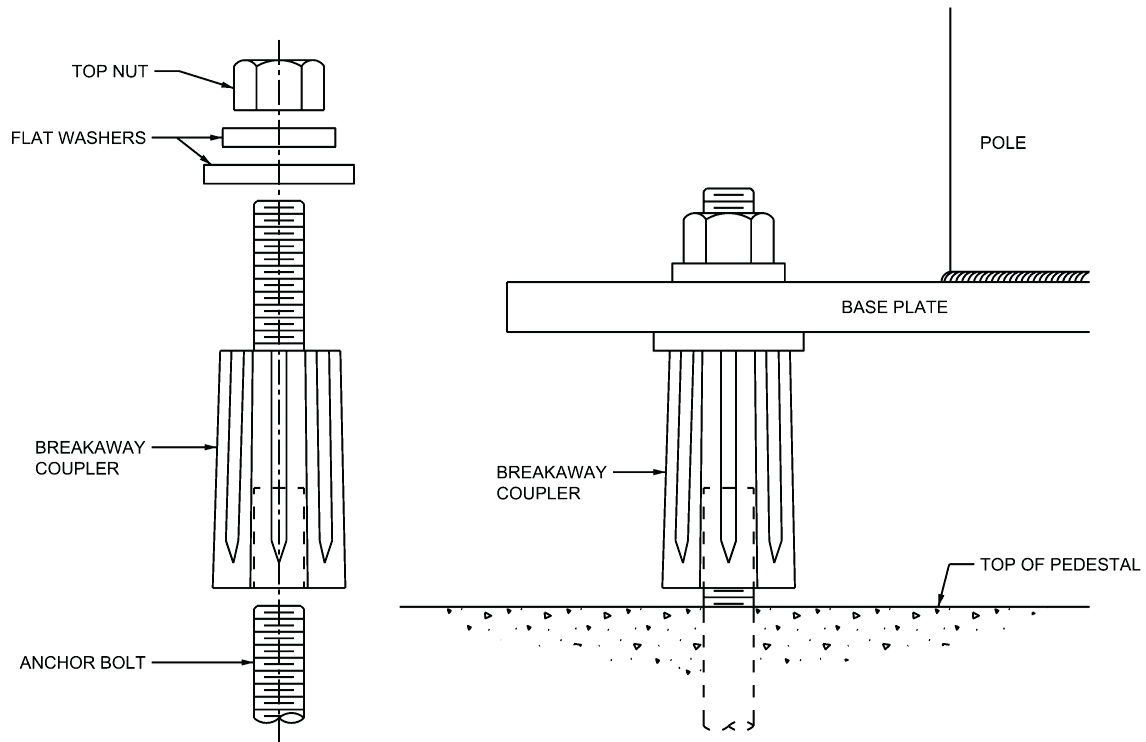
Illustration. Cast aluminum breakaway coupler assembly.
